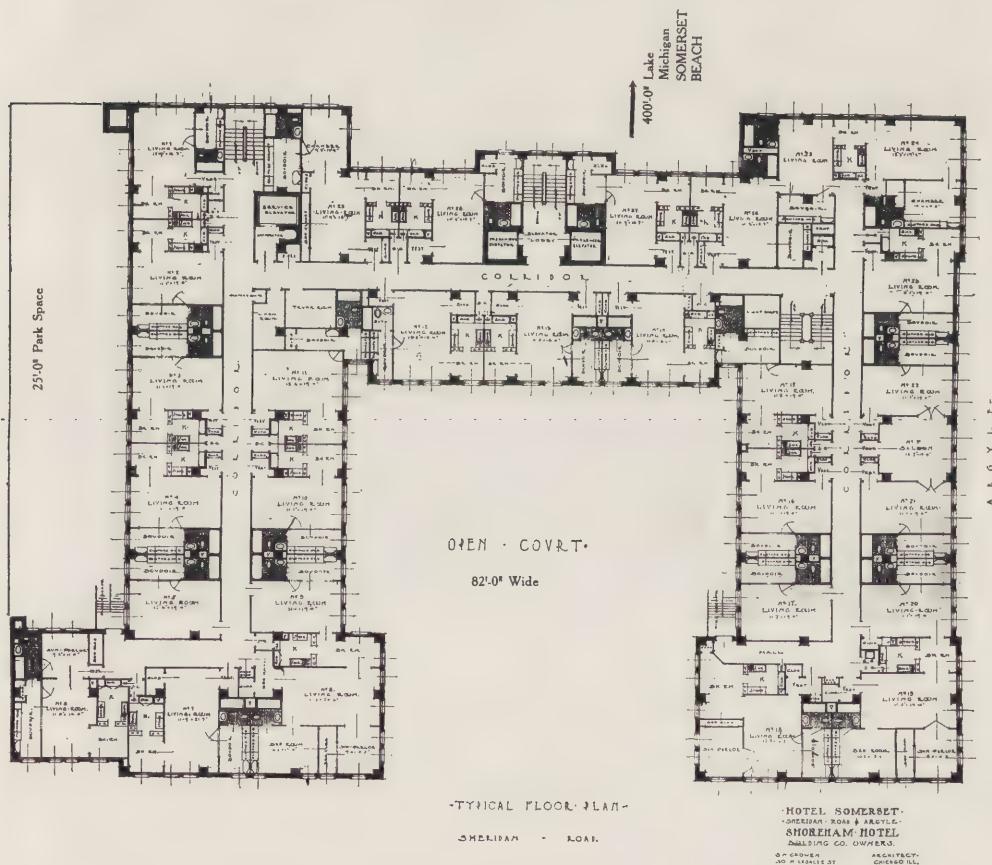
TYPICAL FLOOR PLAN—HOTEL SOMERSET, CHICAGO, ILLINOIS.
